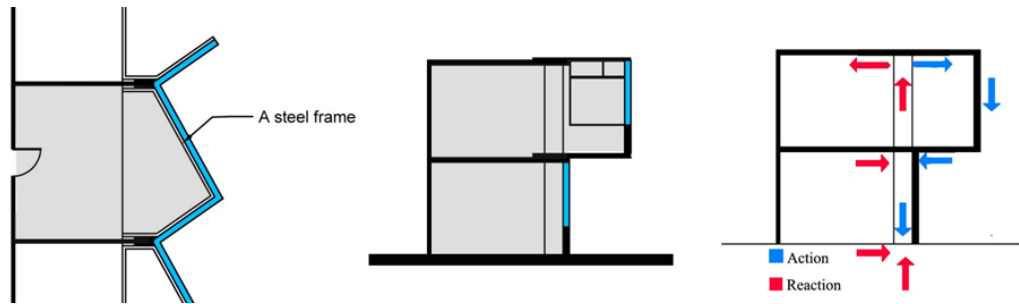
This diagram which concerns one of the many analyses in Chapter 10 section 1, shows the way a multi-angled façade unit is connected to a building façade (to the left) and a forces diagram (to the right)
